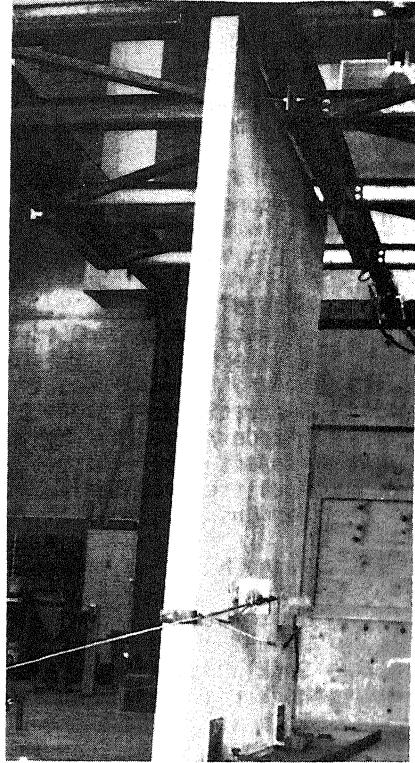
Test II Overall View of Precast Cladding Panel & Test Set-up
